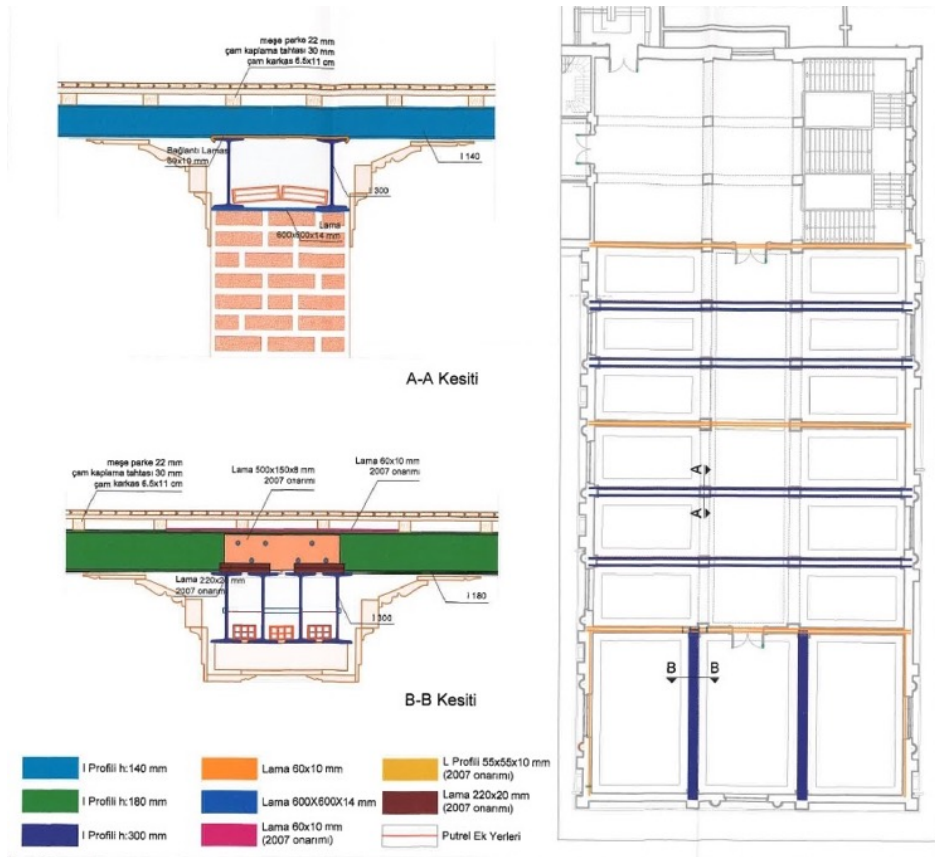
Construction sections drawn during restoration process from Hall 21 and Hall 22 (*Güryapı İnşaat* Construction site report, November 2012, drawn by Rabia Şengün, IDSMArchive)
